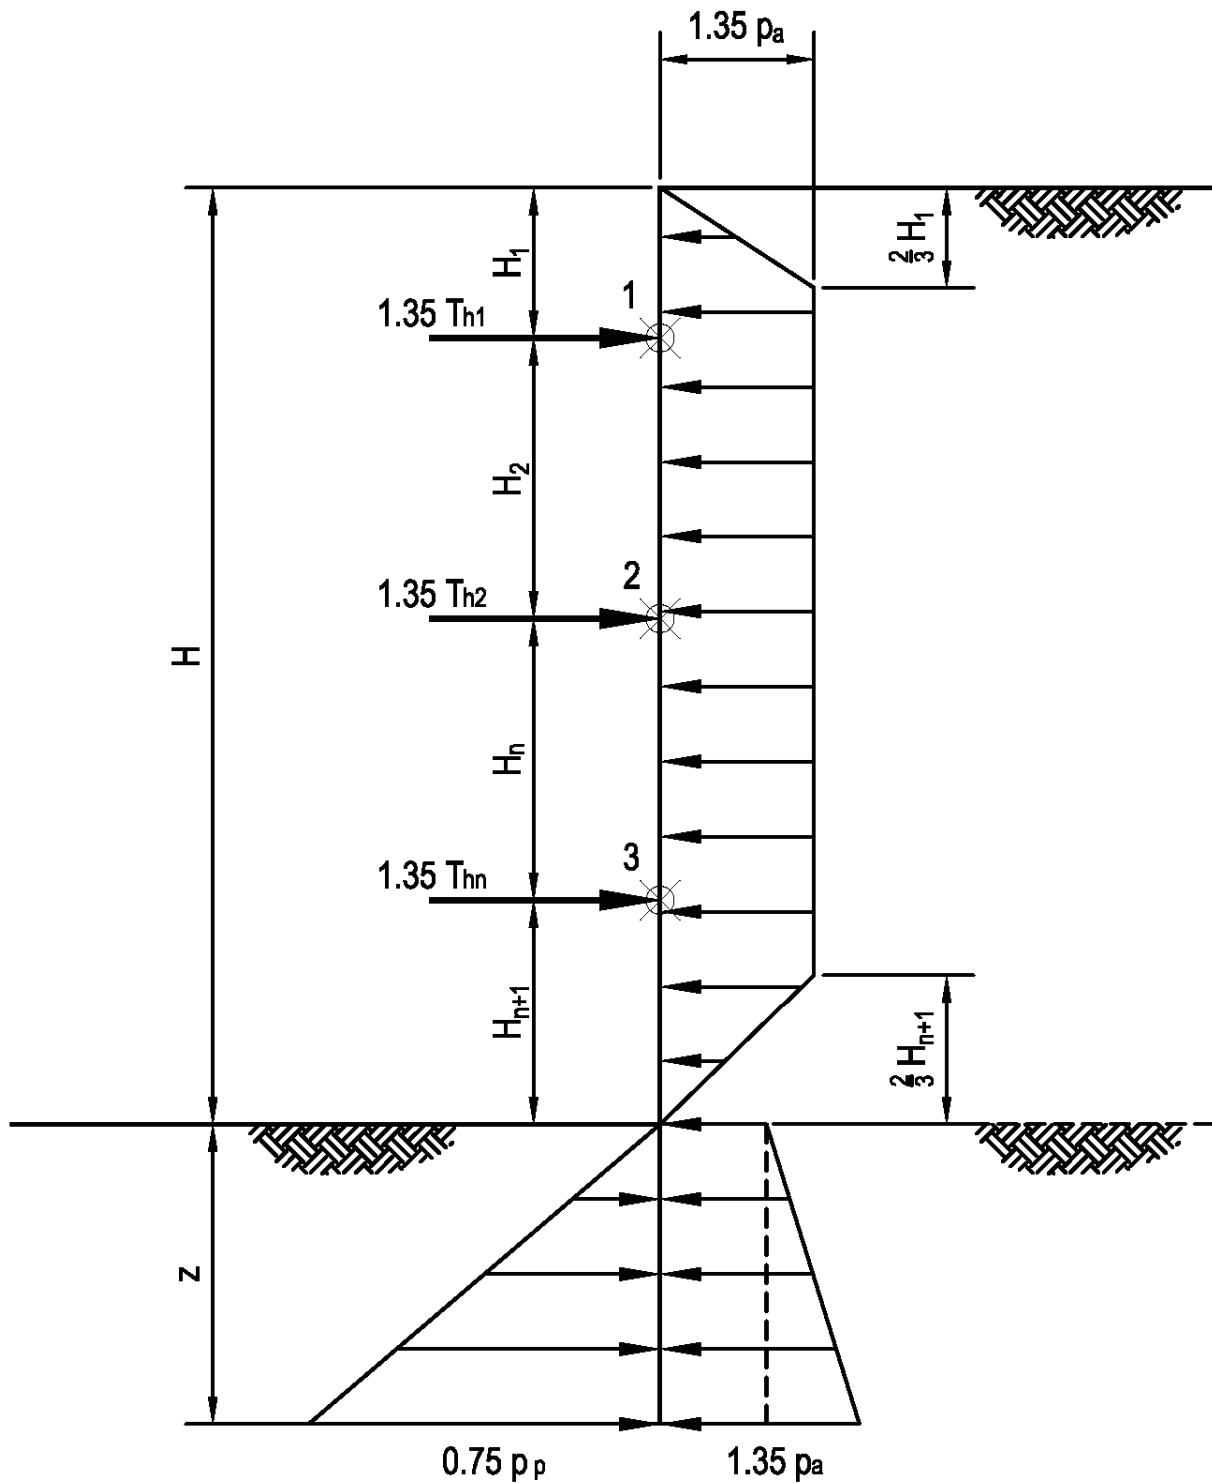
Determining Minimum Embedment Depth for Static Condition (Strength I Load Case)
